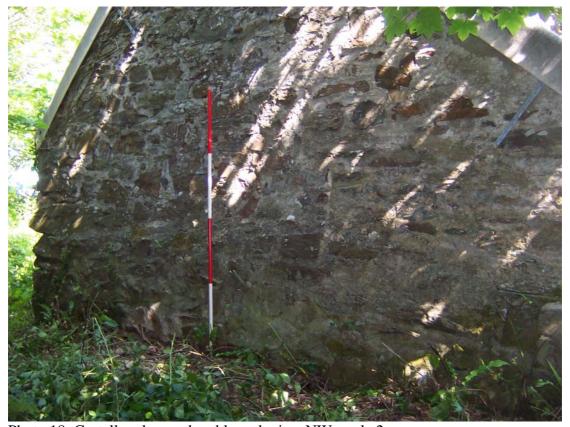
Castell-cadw south gable end, view NW, scale 2m
